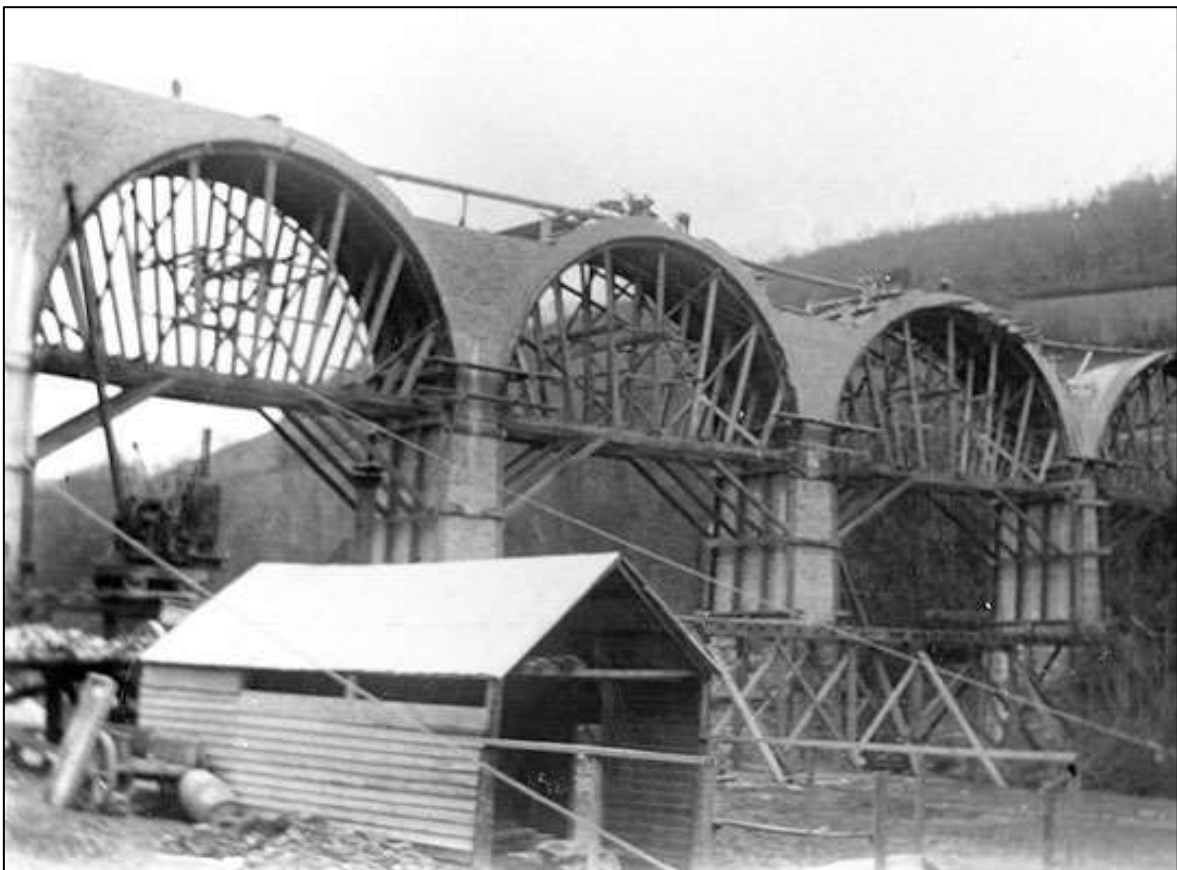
PHOTOGRAPH OF THE VIADUCT UNDER CONSTRUCTION IN 1896; VIEWED FROM THE NORTH-WEST (©LYNTON & BARNSTAPLE RAILWAY WEBSITE).
